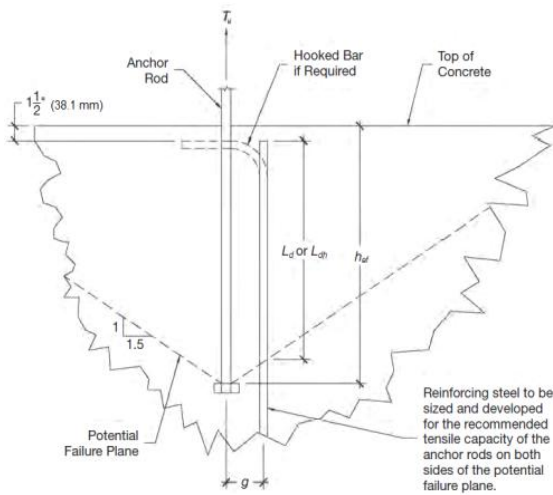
The use of steel reinforcement for in thin slab developing anchor rods [6]
